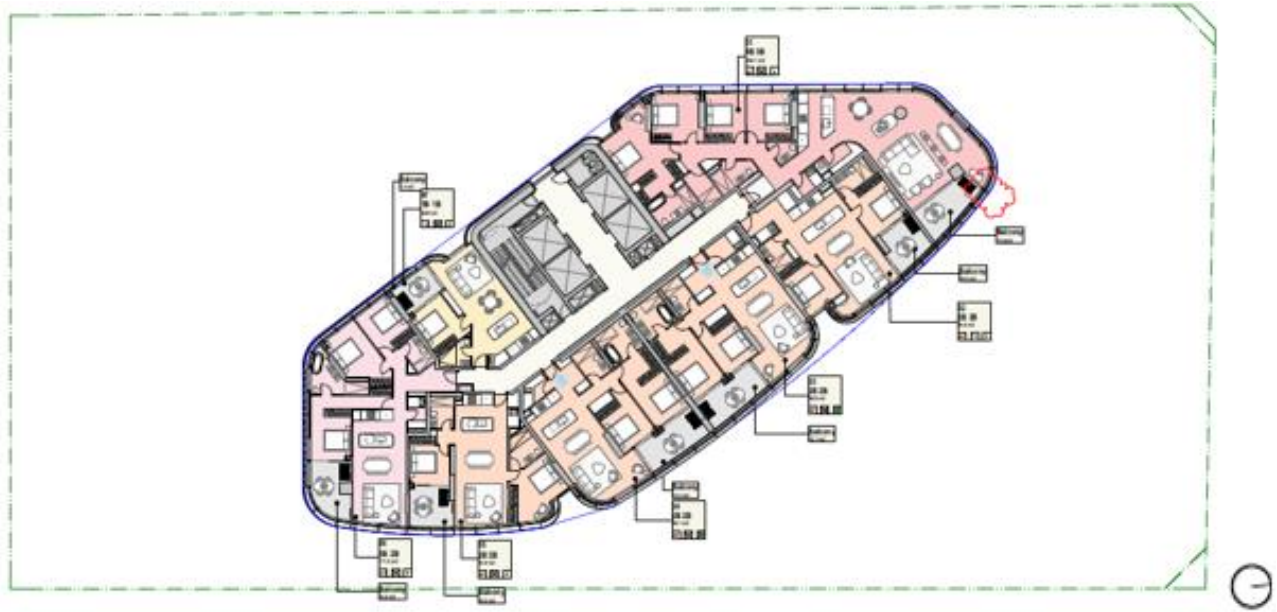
| Proposed typical apartment floor plan (Source: Ethos Urban RtS amended architectural drawings)
